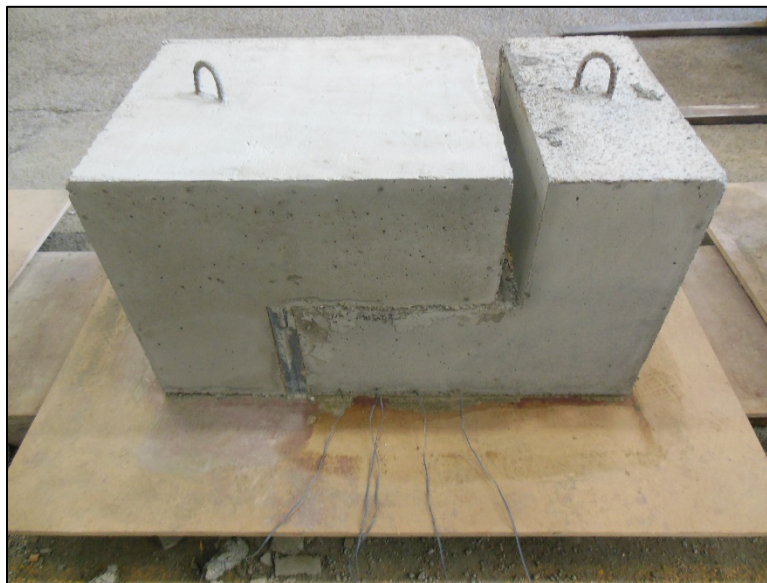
A specimen containing #4 (#13M) reinforcing bars across the interface with the formwork removed
